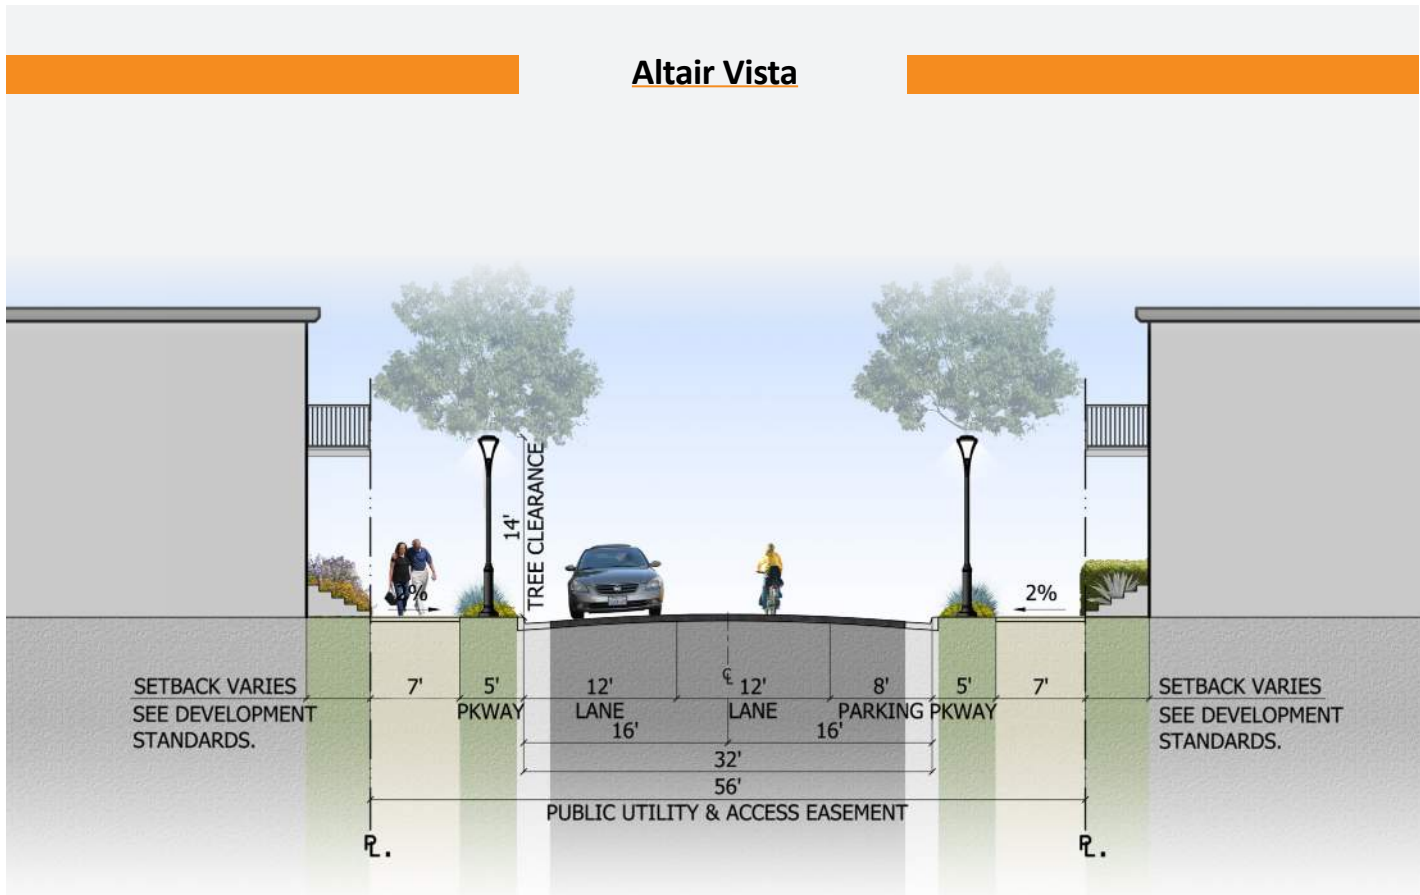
Street Section – Altair Vista – Planted Parkways (Private, TTM lot K)
